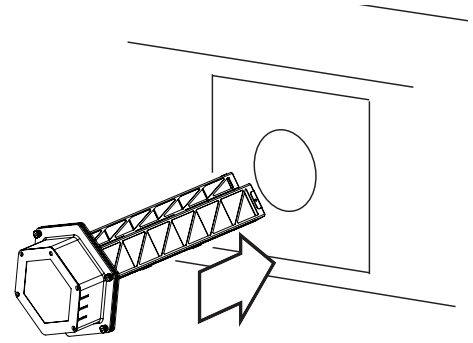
Cut opening in duct, attach mounting plate, and install device
